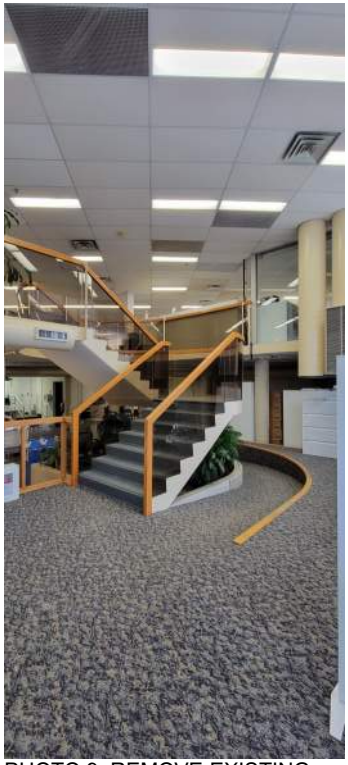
REMOVE EXISTING GUARDRAIL/HANDRAIL AND TEXTURAL WARNING STRIPS (STAIR A)
